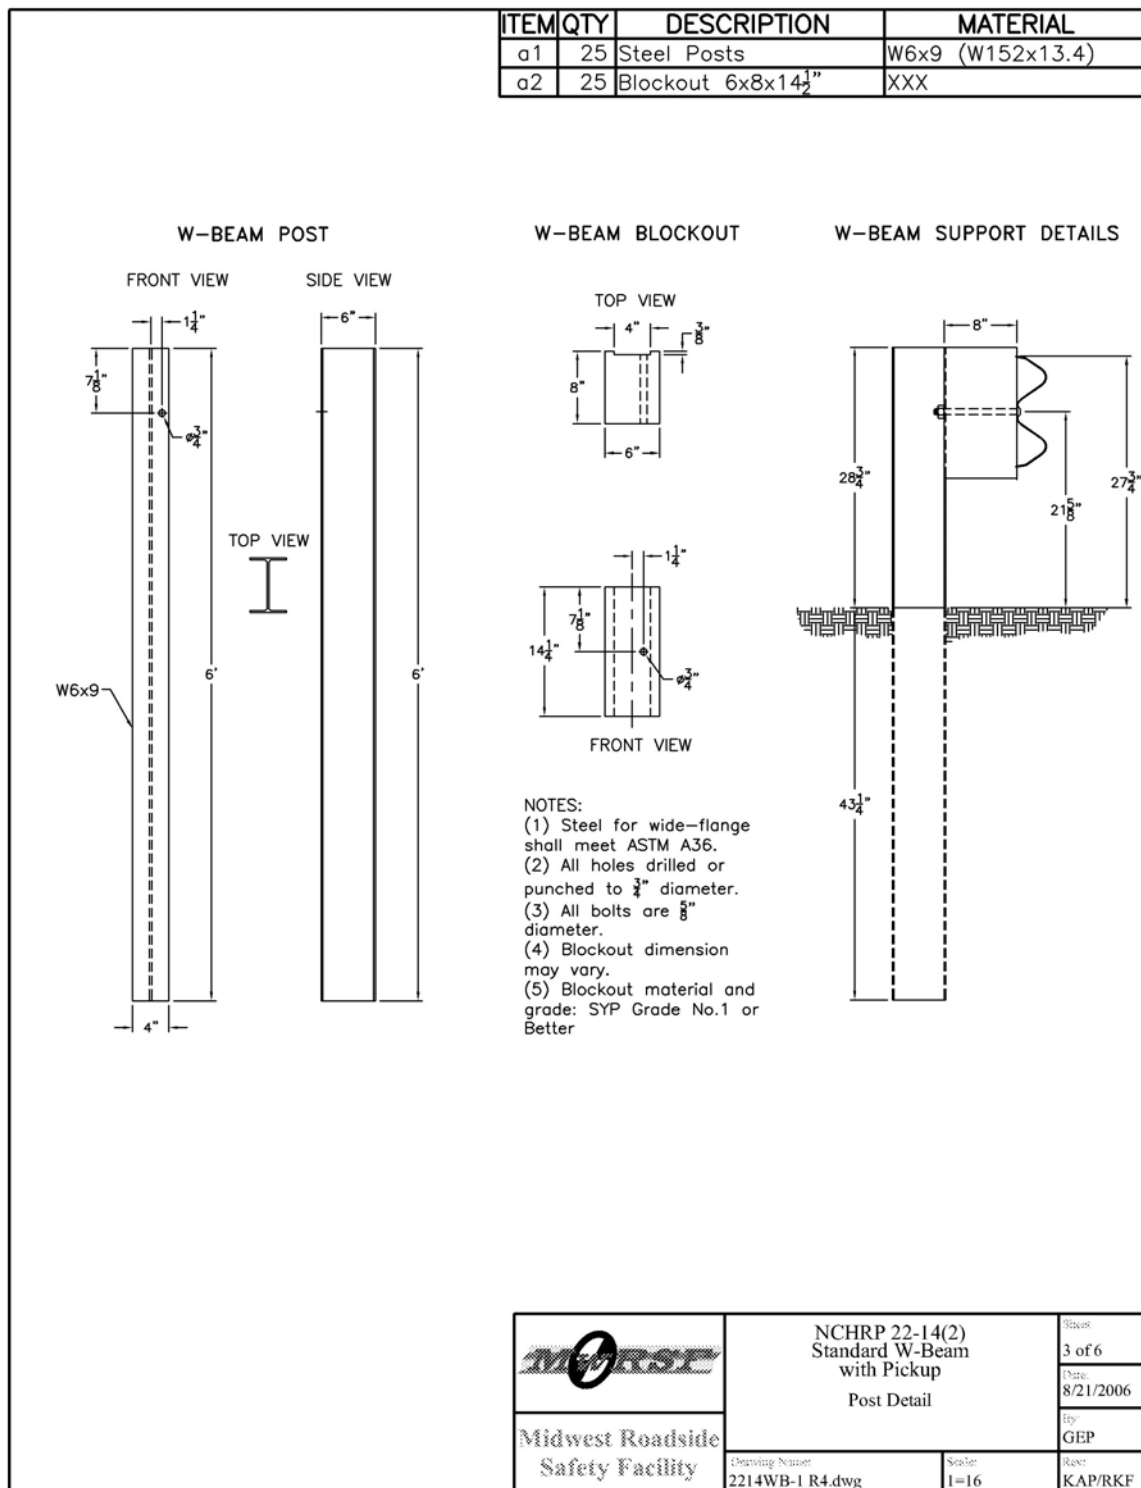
Standard Height, Strong Post, Wood Blockout W-beam Guardrail Post Details (English)
